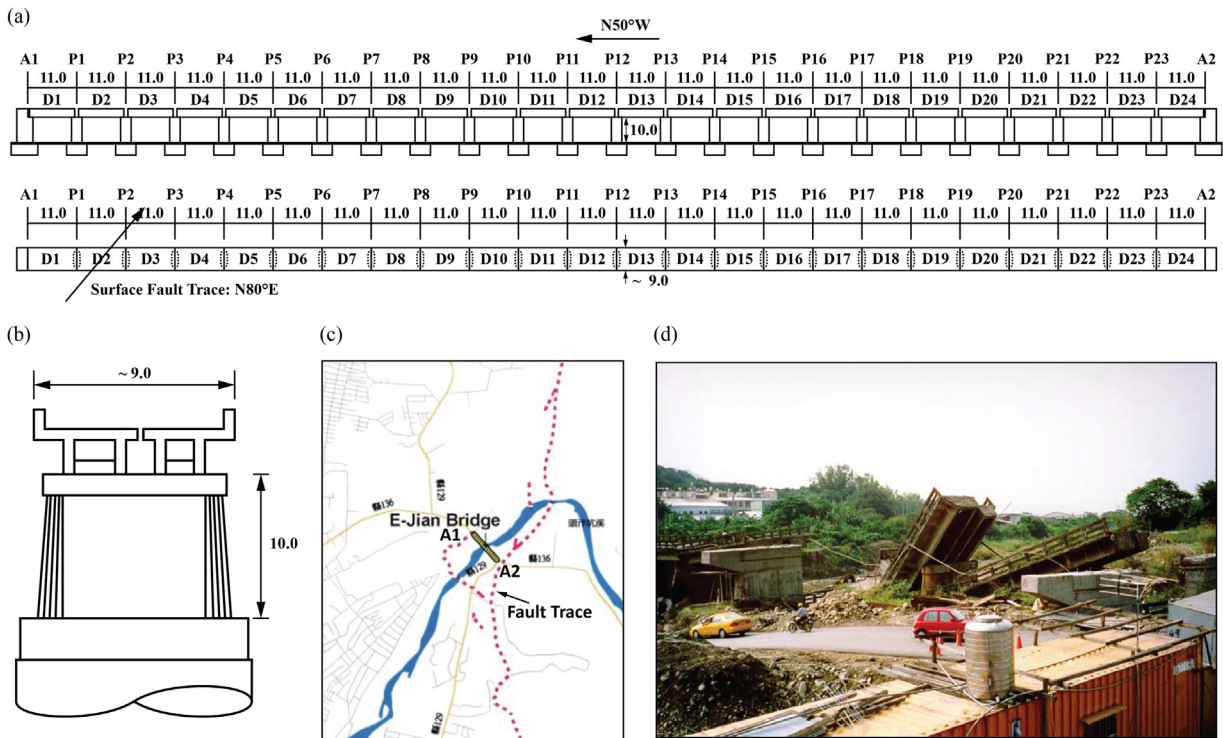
E-Jian Bridge during the 1999 Chi-Chi earthquake: (a) elevation and plan views of original bridge (unit: m); (b) typical section of bridge (unit: m); (c) map showing bridge crossed by surface fault rupture; (d) collapsed bridge (Fig. 9c is modified from Buckle and Chang [15]; Fig. 9d is reprinted from Buckle and Chang [15]).
